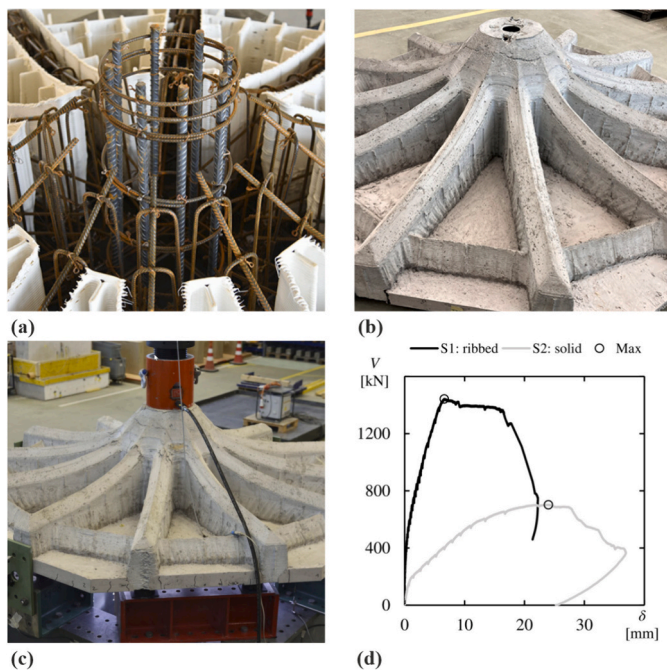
Column-slab connection of the optimised ribbed concrete slab: (a) construction stage with finished rib walls and inserted reinforcement cages before printing of the caps [41]; (b) finished specimen [41]; (c) structural testing of specimen [61]; (d) load-deformation diagram [41].
